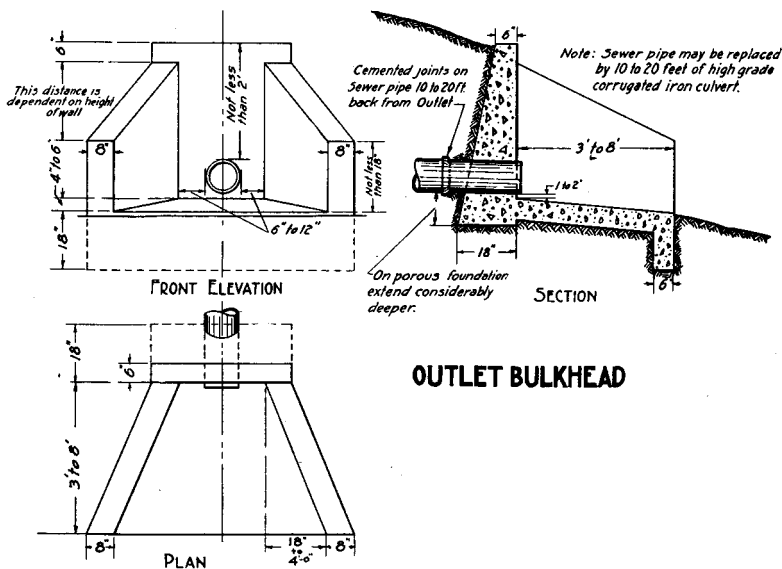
Good Type of Outlet Bulkhead for Tile Drain
